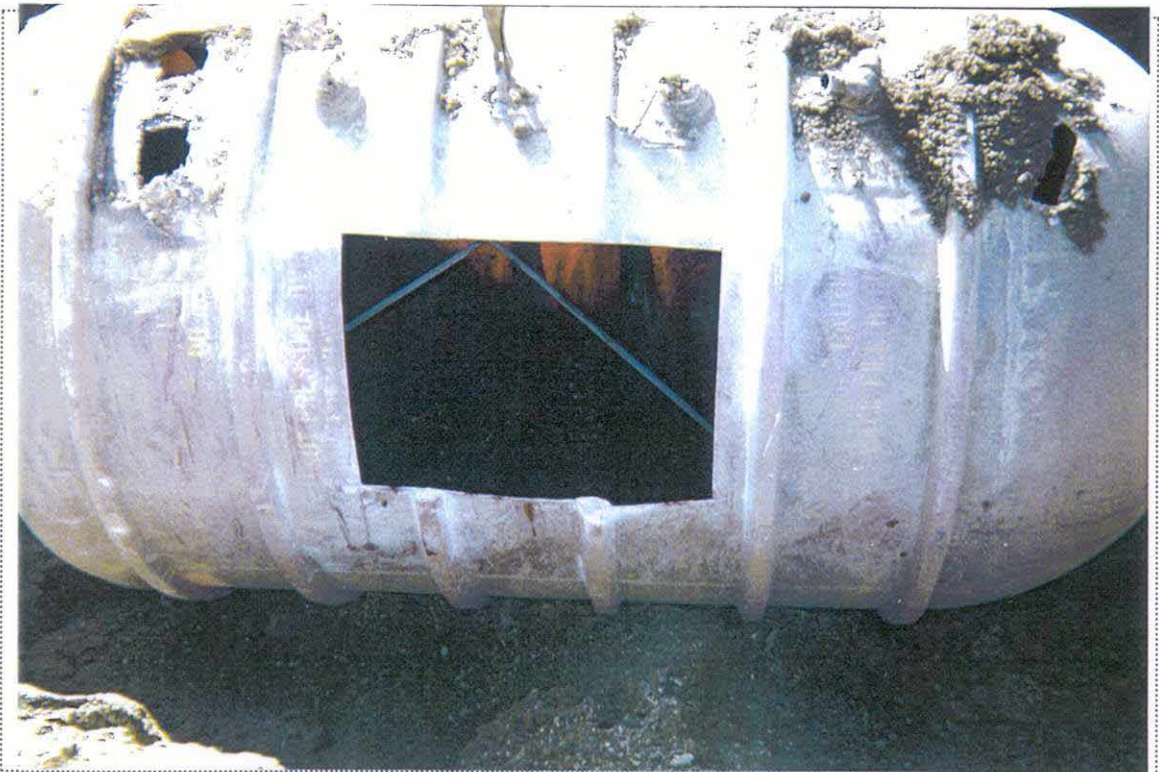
View of the cleaned interior of UST-9035 (looking west/southwest) (Note: A small amount of soil fell inside the tank after cleaning the interior was completed).
